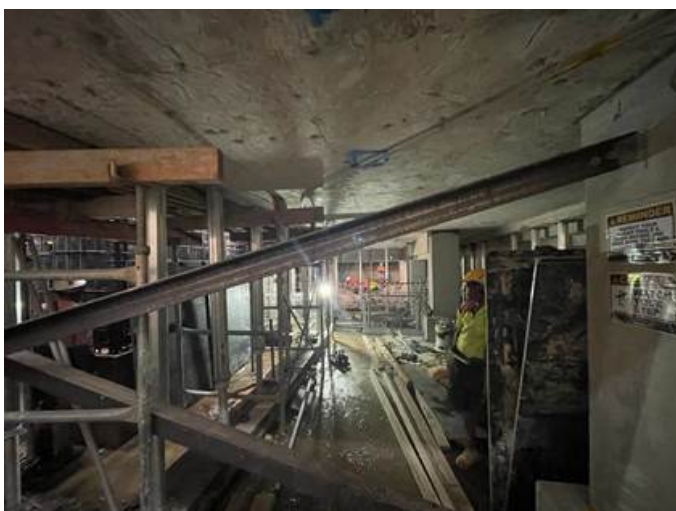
General view of the lower ground floor from the stair landing, looking west.
